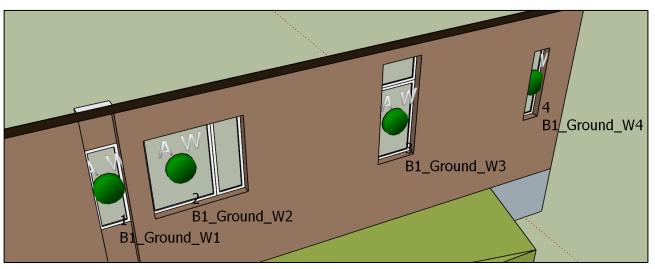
Compliant VSC windows on South façade of 11 Wood Street
